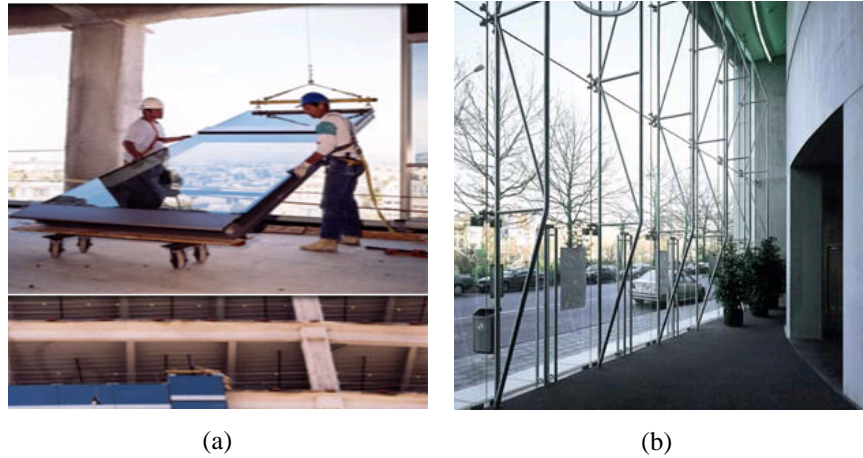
(a) Assembling of a stick curtain wall system and (b) Bolted glazing supported by truss system
